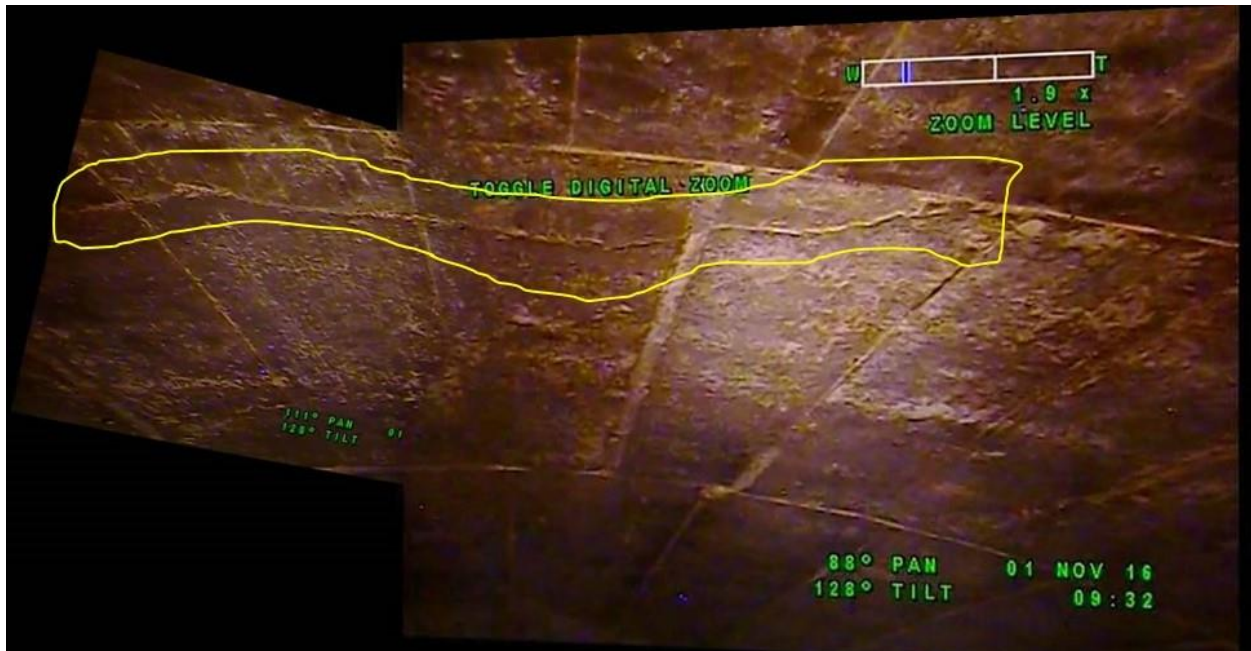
Possible Crack in Tank U-102 (RPP-RPT-59272)
